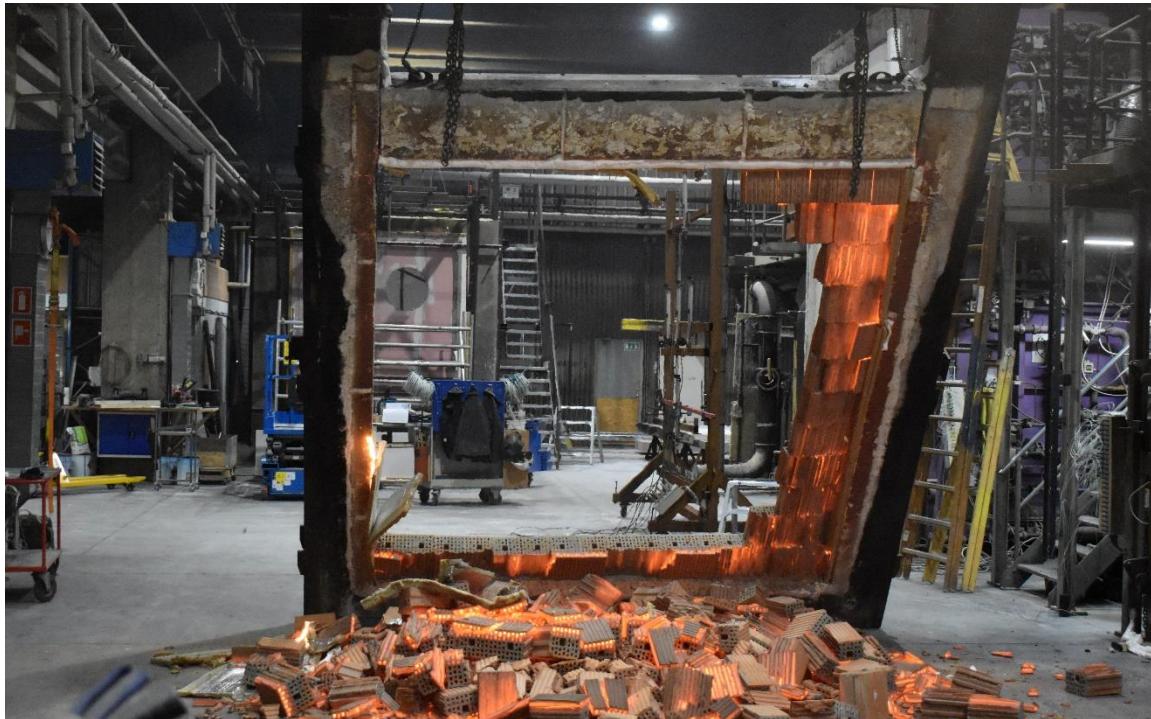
Block wall teared down, so costumer can see the bricks inside.
